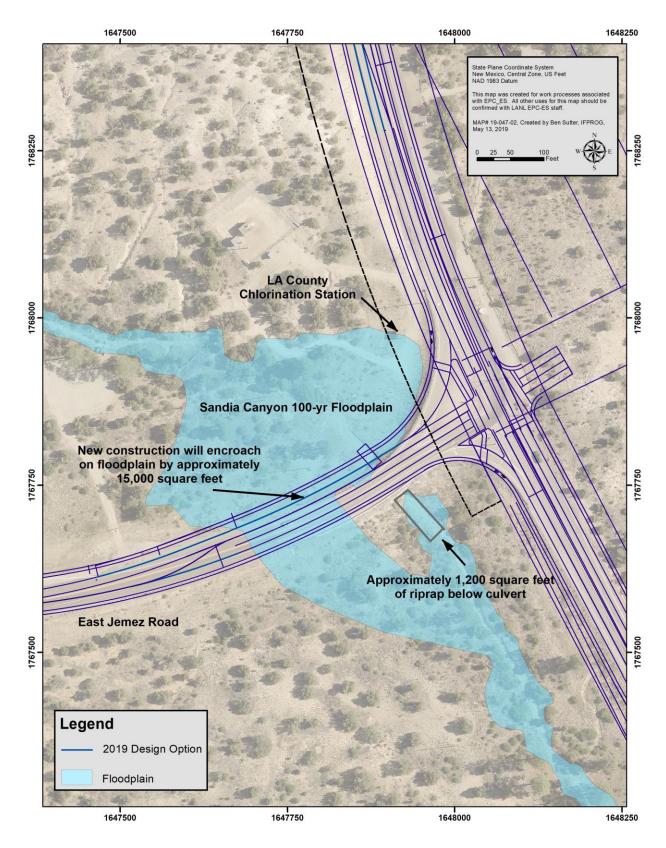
Aerial photo showing current intersection configuration with new configuration overlay and 100-yr floodplain.
